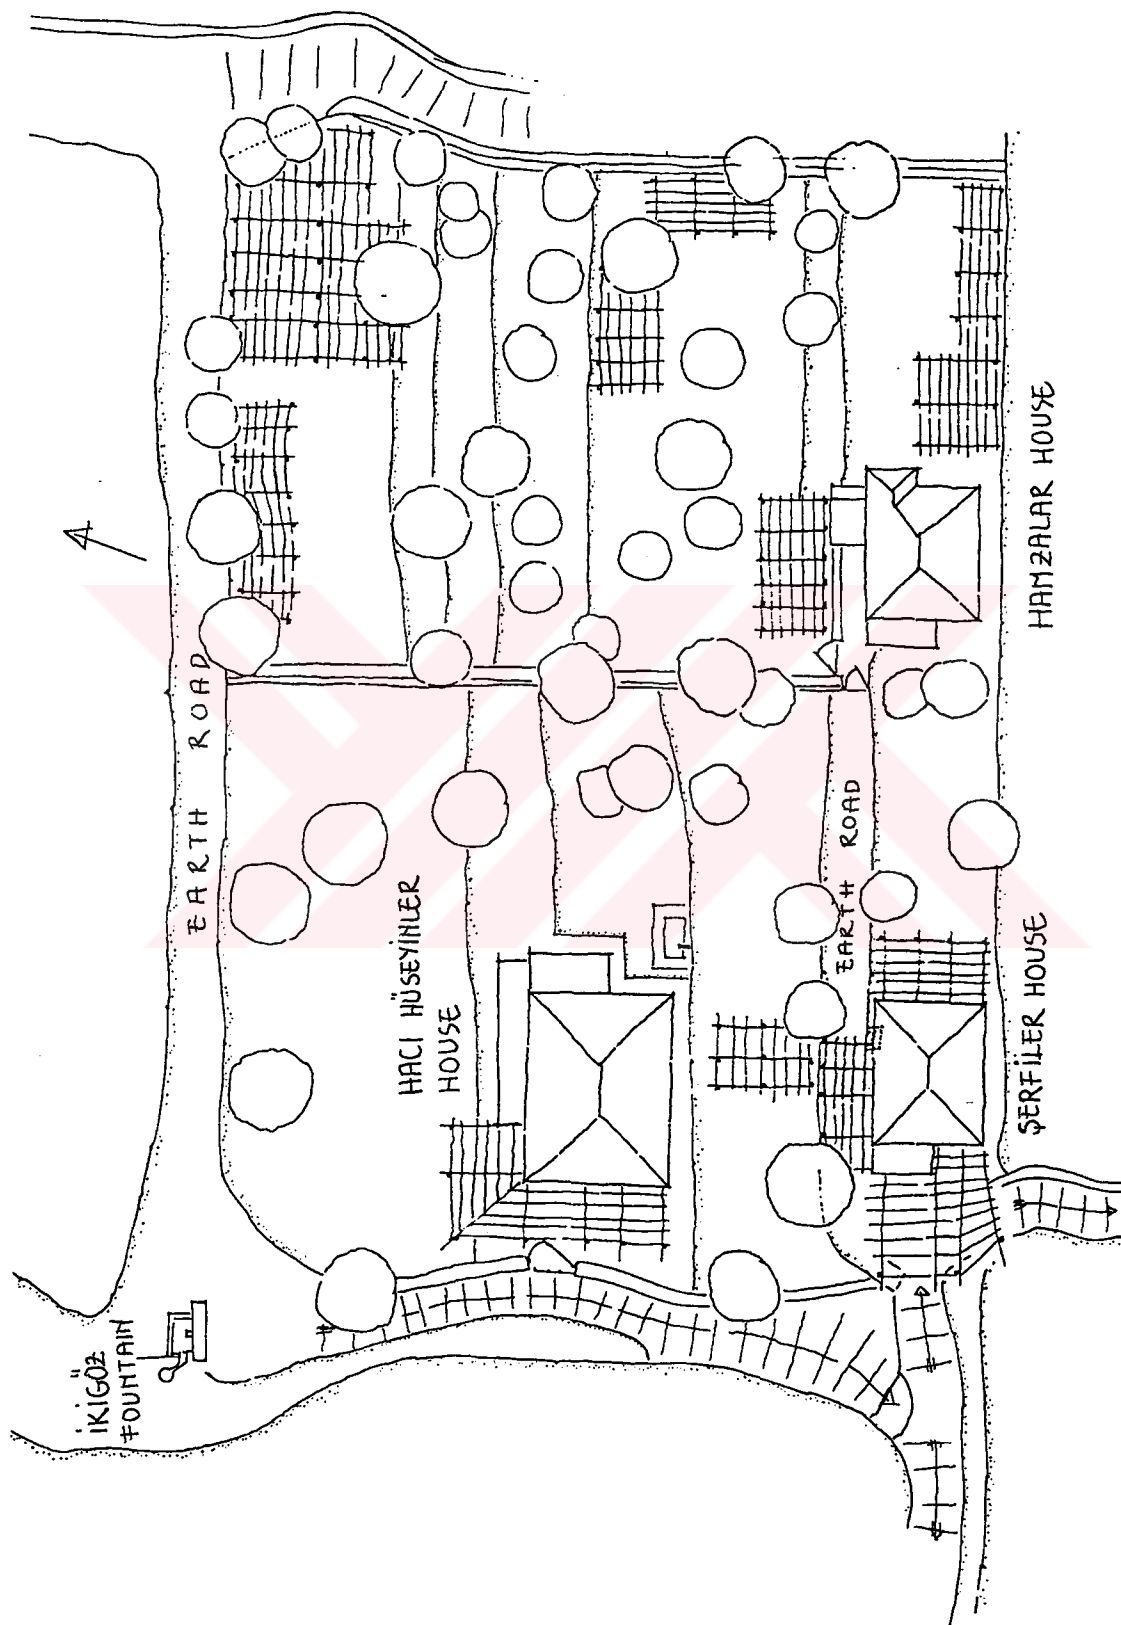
Schematic site plan of Hamzalar House-not to scale.
